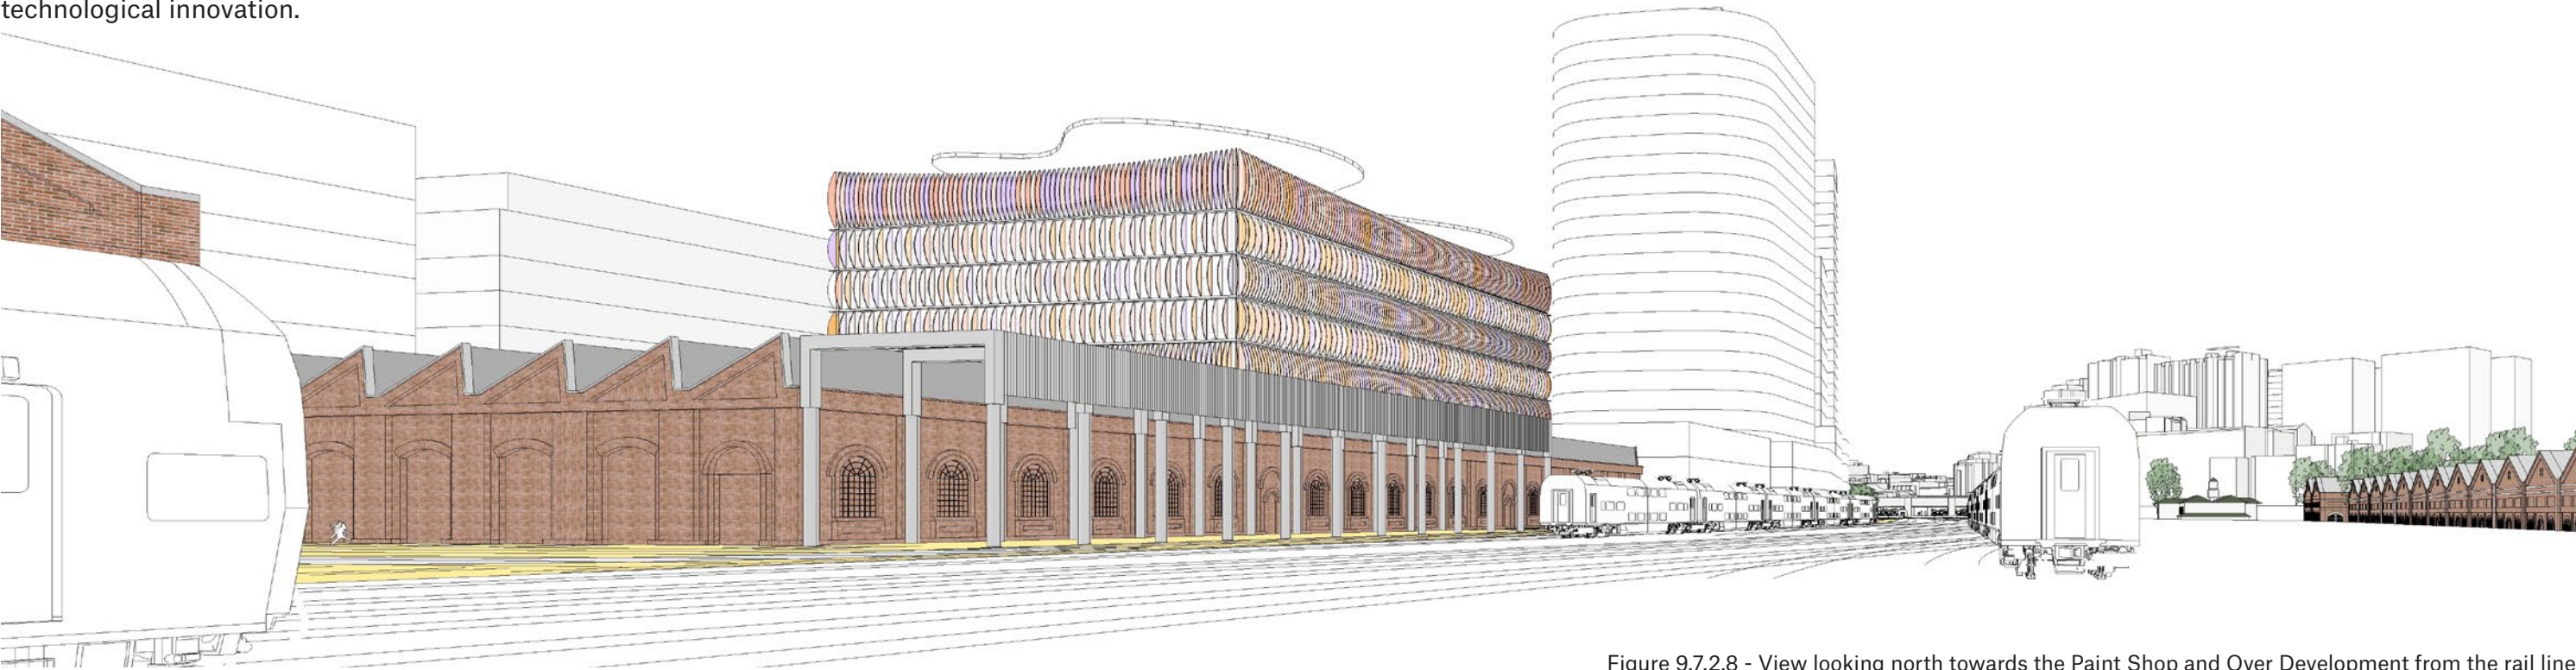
View looking north towards the Paint Shop and Over Development from the rail line
